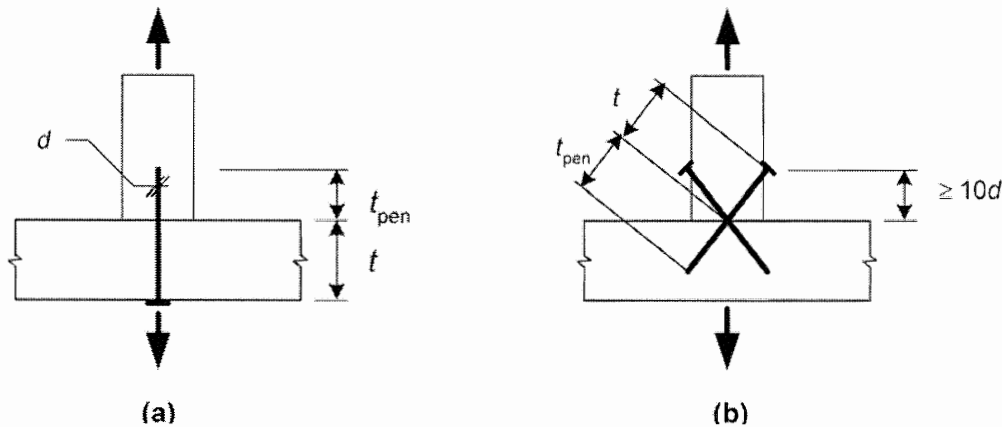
(a) Nailing perpendicular to grain and (b) slant nailing
